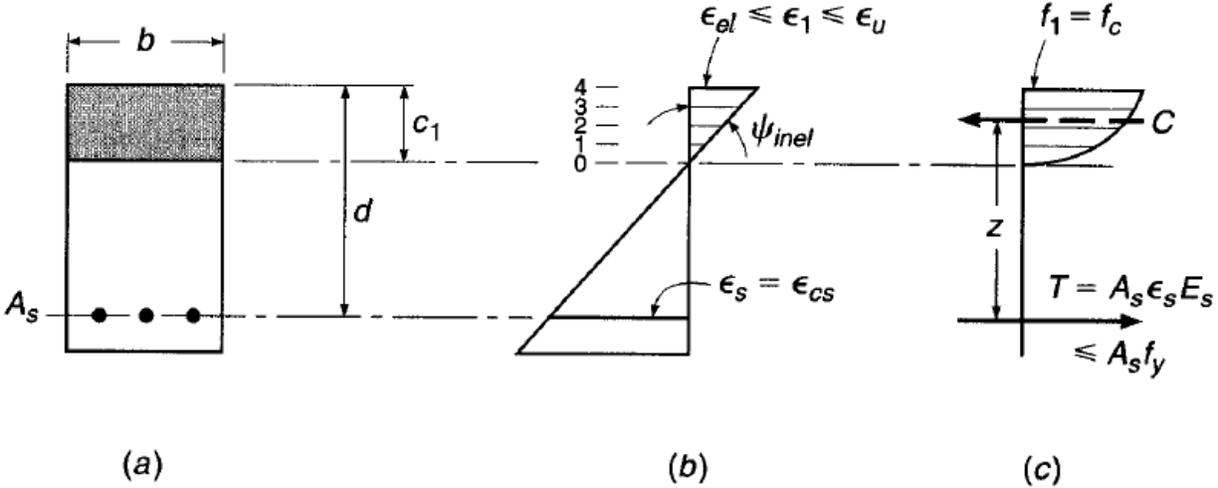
Cracked beam with concrete in the inelastic range of loading
